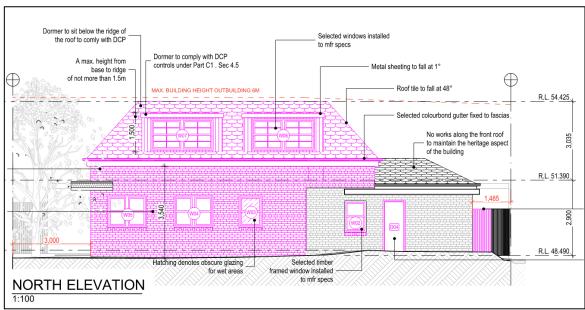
North elevation of the proposed outbuilding, showing presentation of dormer windows in relation to roof form and remainder of ourbuilding (*Source: Gardner Design and Drafting*).
